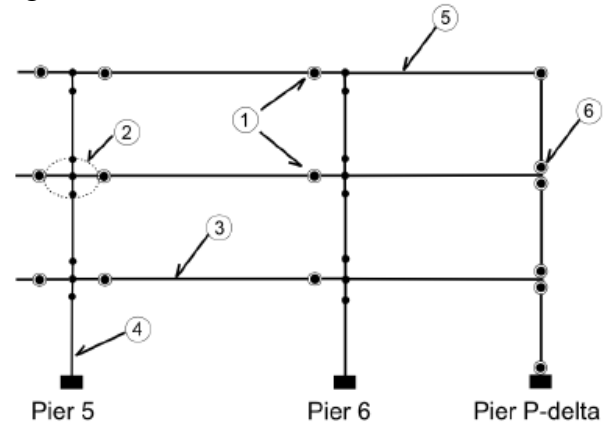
Structural scheme of a generic bay and the P-delta leaning column. (1) Reduced Beam Section connections, (2) Panel zone, (3) Elastic beam-column elements, (4) Columns, (5) Rigid truss, (6) P-delta floor connections (Mayencourt, 2013).
